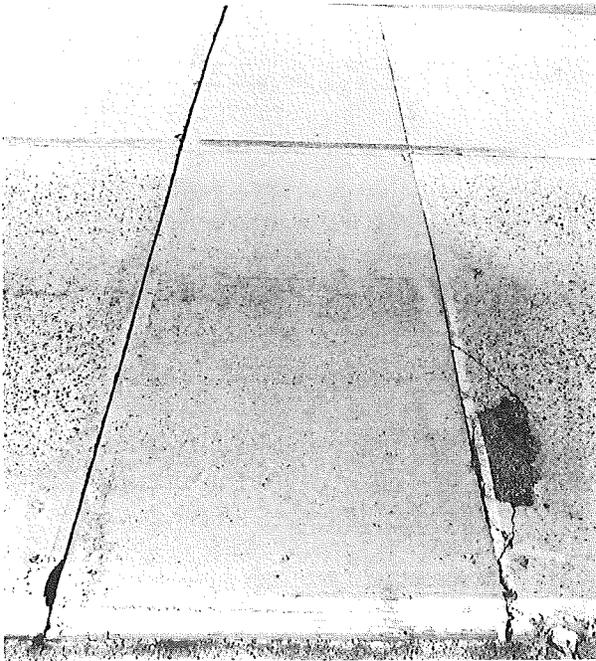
Failure in old pavement slab along hook-bolted joint resulting from locating repair limit in unsound concrete.
